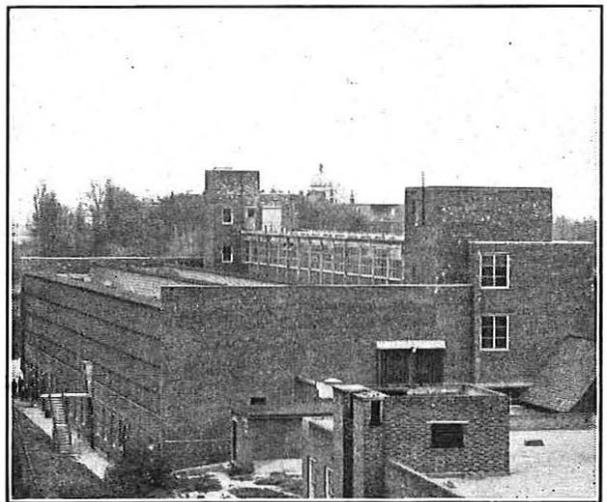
VIEW OF NEW BUILDING FROM WEST OF SITE. (THE STEPS ARE A FIRE ESCAPE FROM WORKSHOP FLOOR LEVEL; THE WINDOWS BELOW SERVE THE LINE OF LABORATORIES.)
